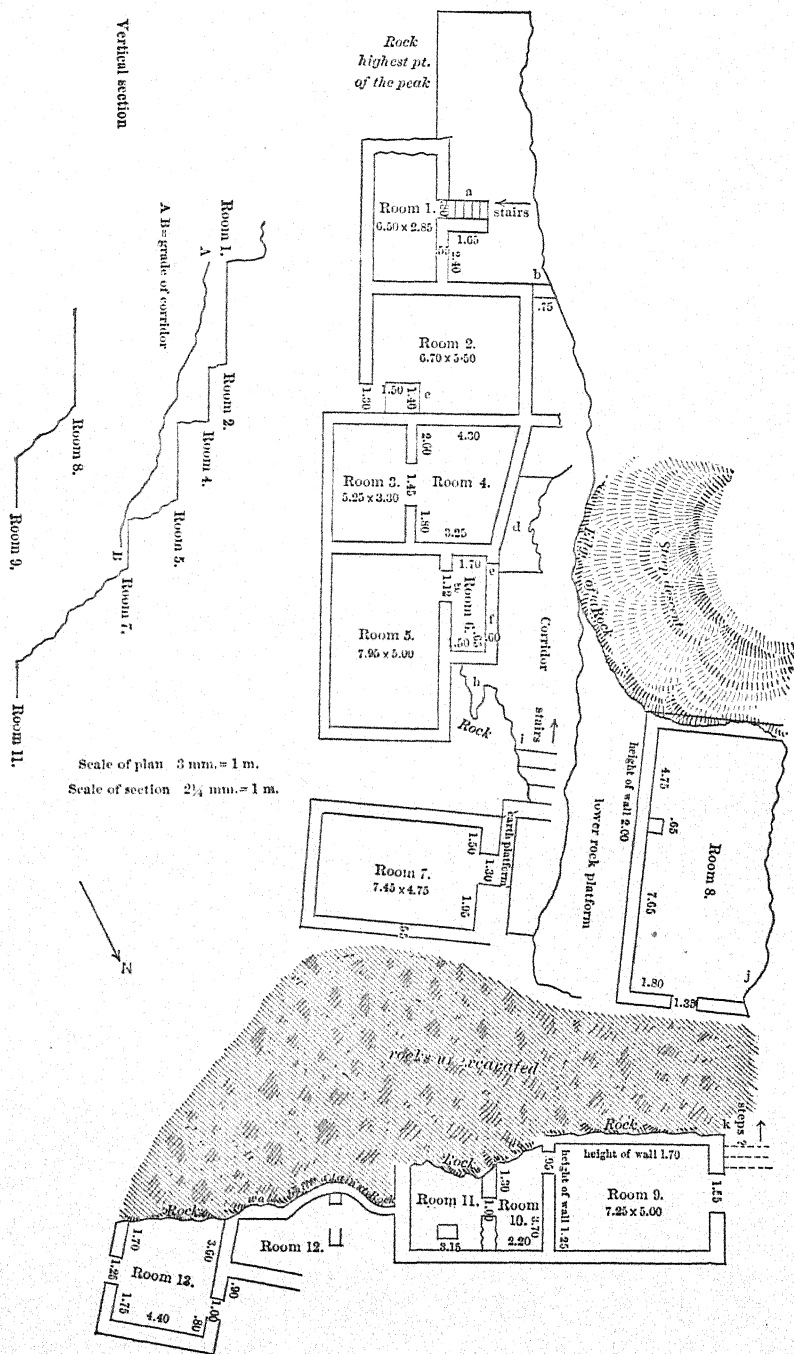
CITADEL OF KAVOUI. PLAN AND VERTICAL SECTION.
